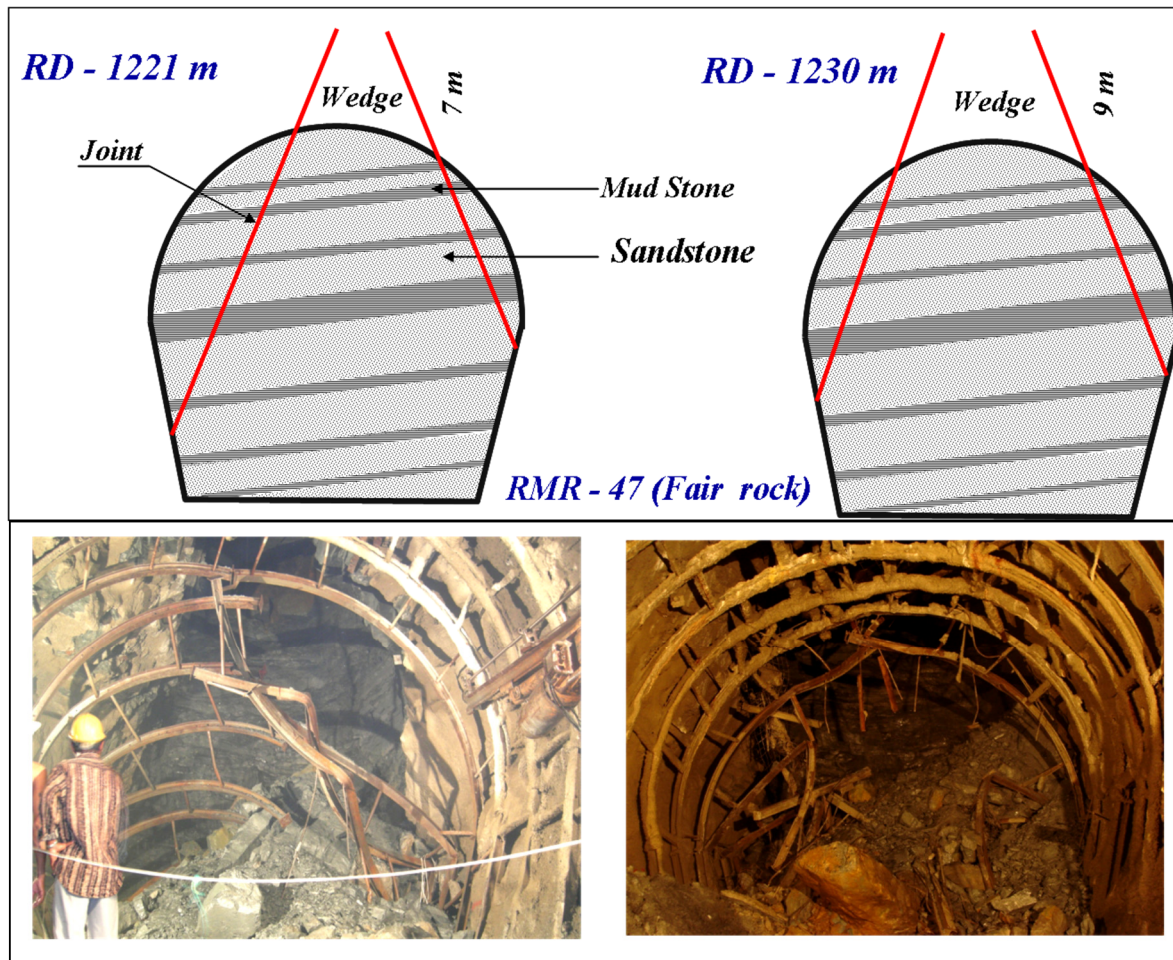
Tunnel Crown Failure at Fractured Zone
